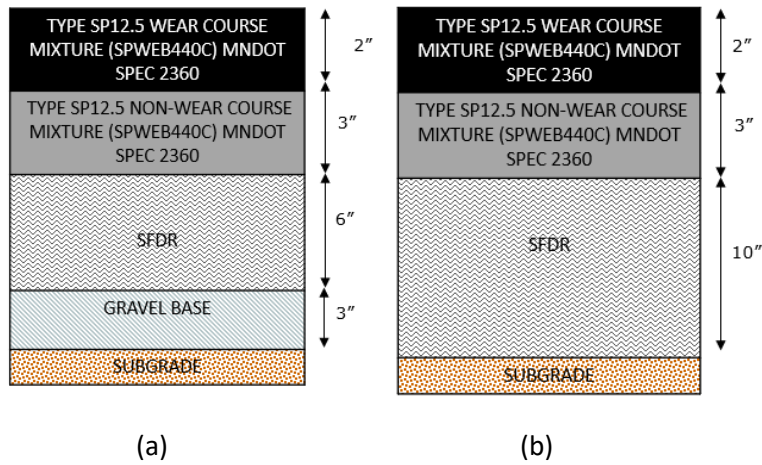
CSAH 101 Final Pavement structure (a) Section D-E (b) Section B-C
